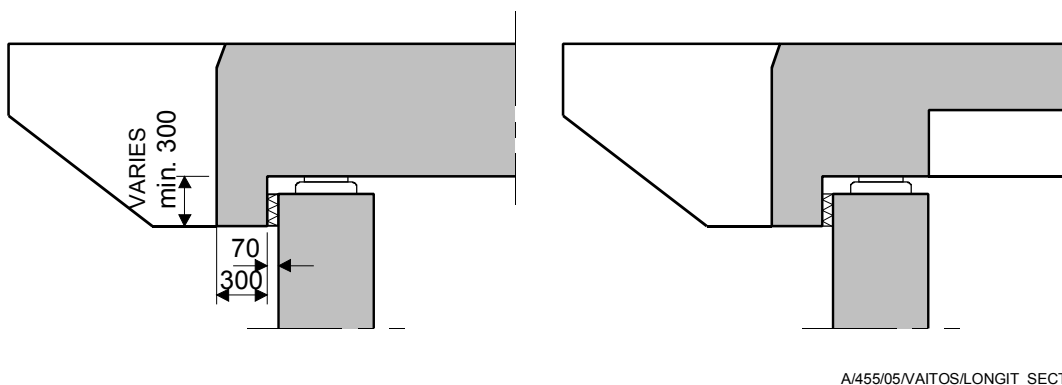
Longitudinal section of a Norwegian slab bridge and a slab-beam bridge. Optional transition slab is not shown (Statens vegvesen 2000).
